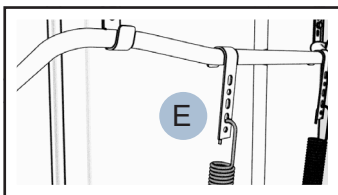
Door Spring Hooks (E) Tension Adjustment
